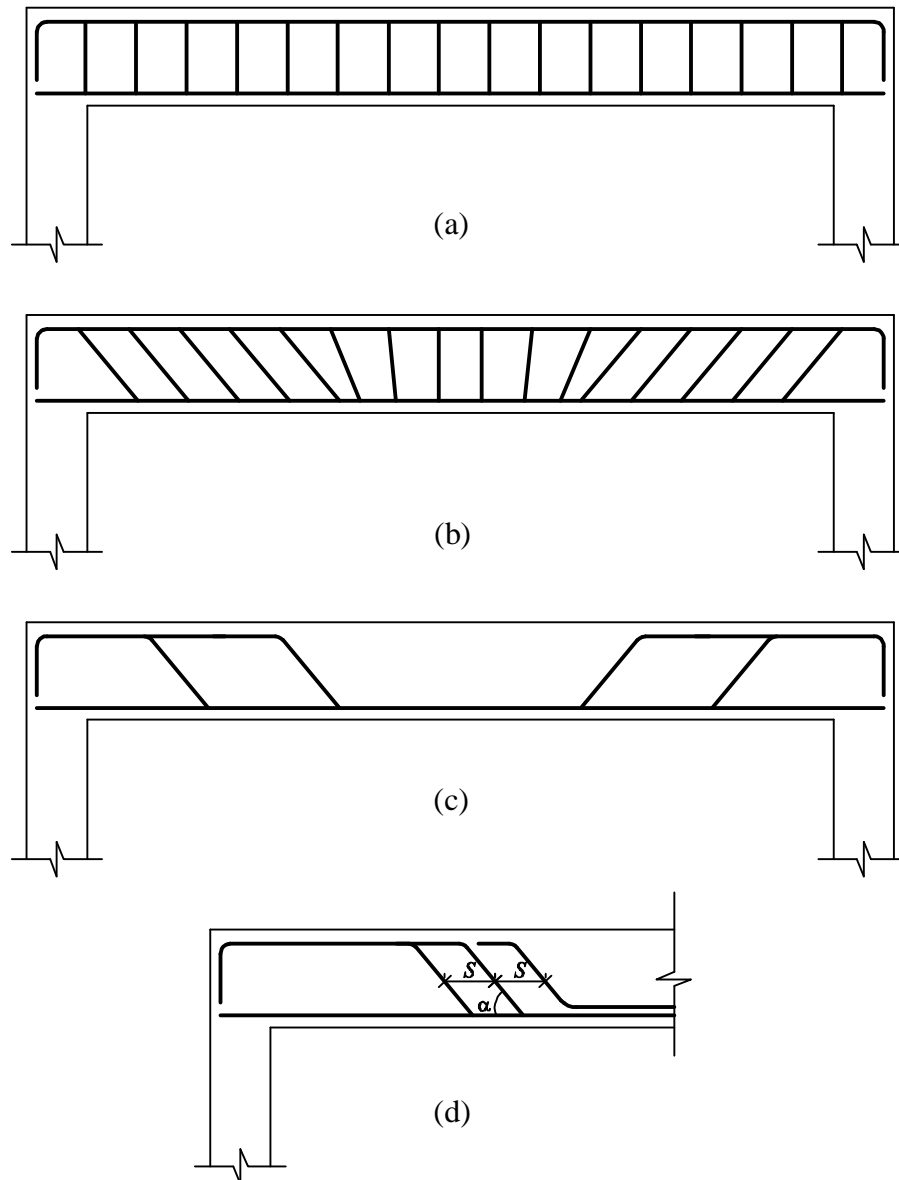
Types of shear reinforcement: (a) vertical stirrups; (b) inclined stirrups; (c) bent-up bars (two groups); (d) bent-up bars (three groups)
